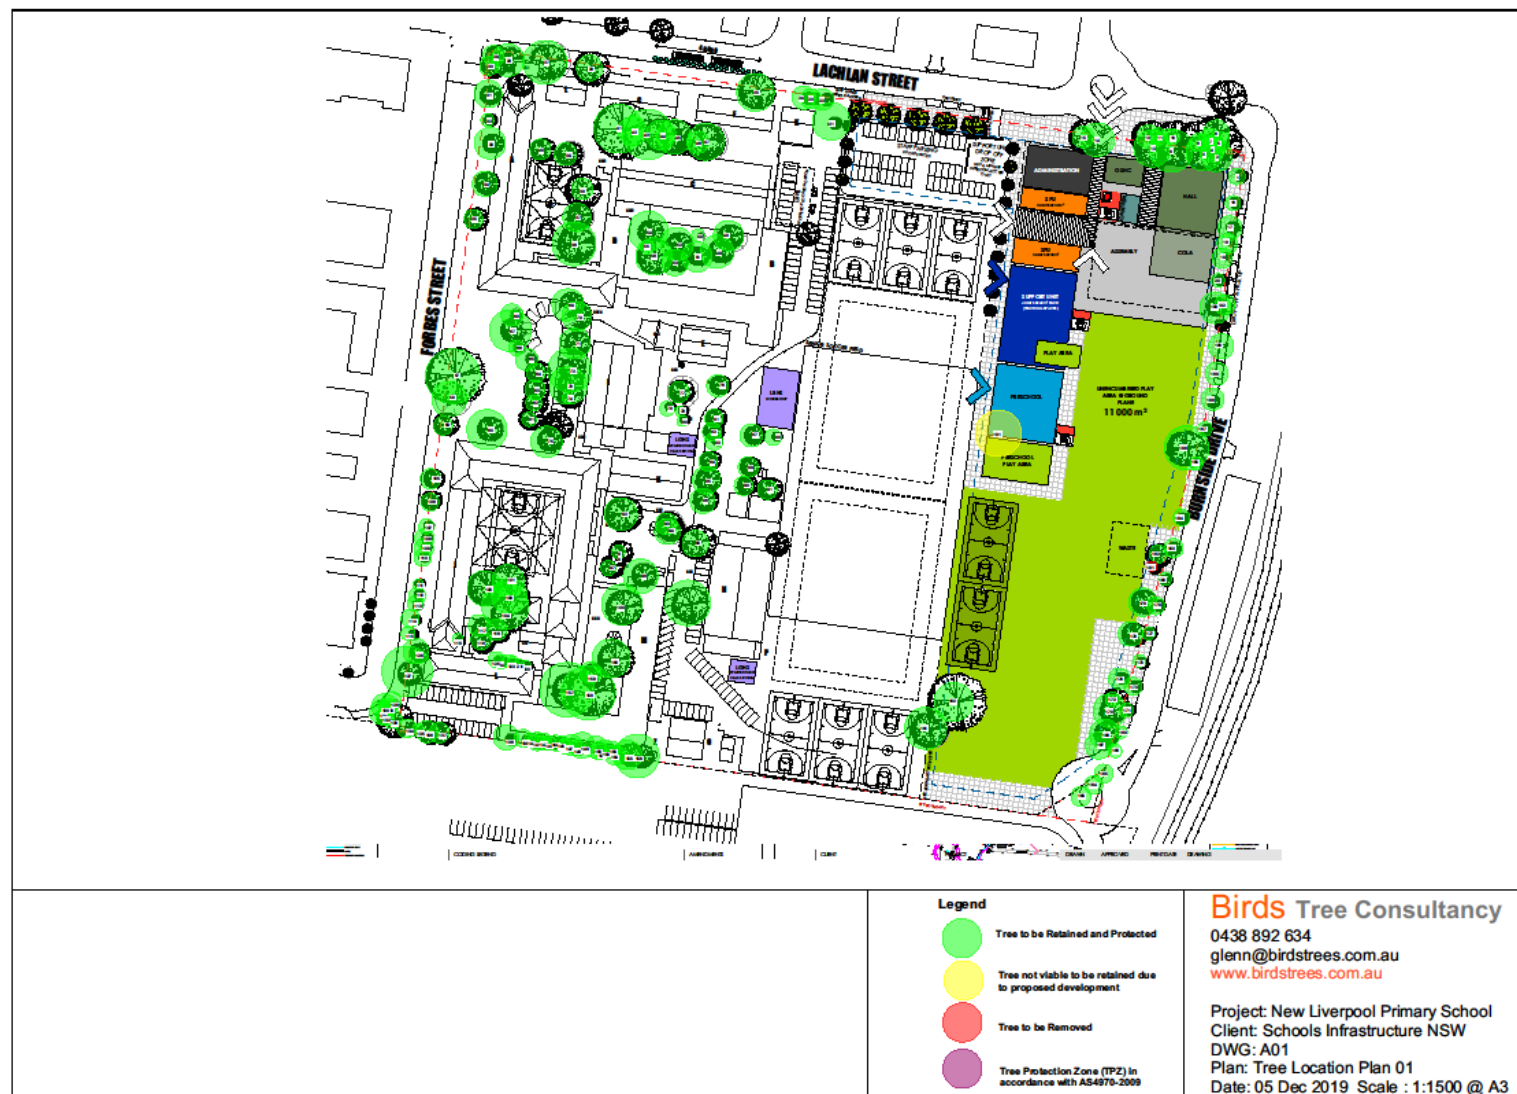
Arborist Plan curtesy of Birds Tree Consultancy
